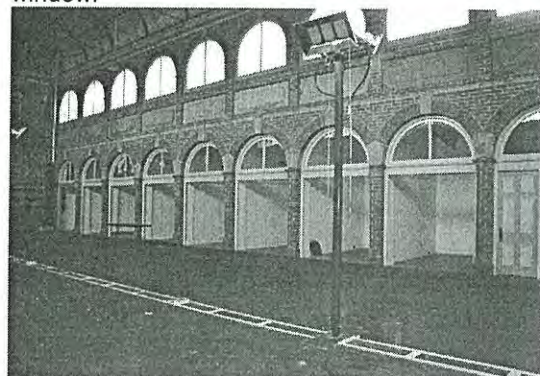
Interior, Exchange Hall (space H01). View of north wall (western half) showing arched booths. The gas heater and stand in the foreground have been introduced.
